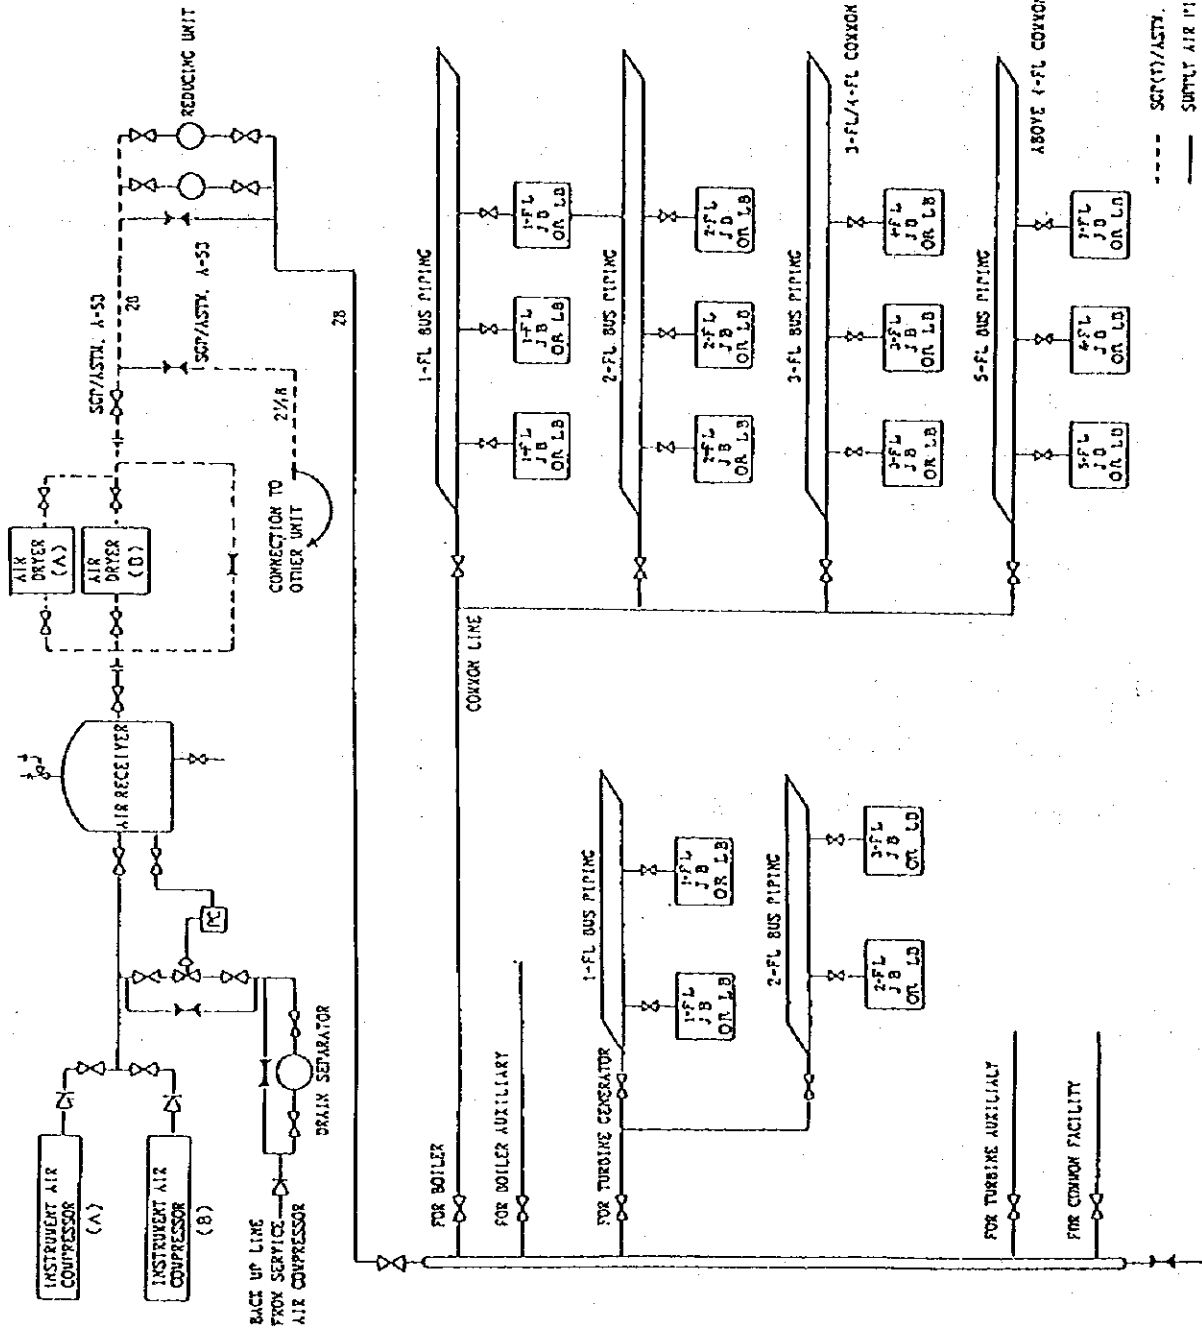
INSTRUMENT AIR PIPING LINE
